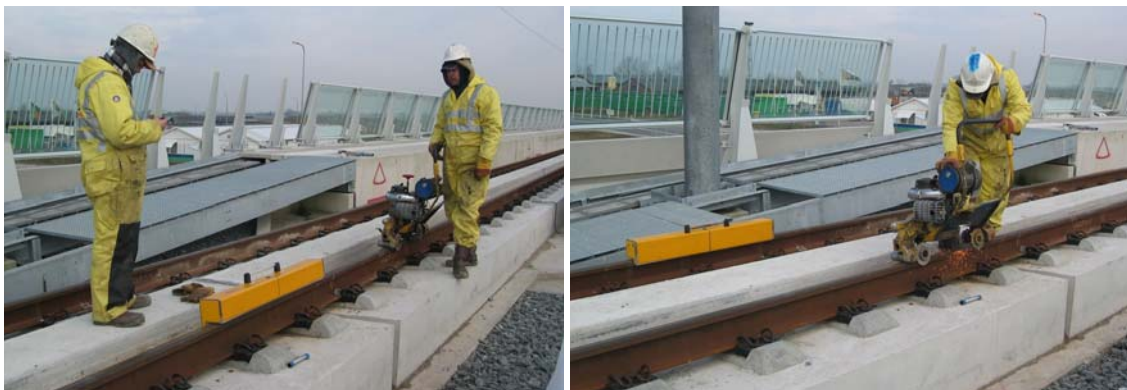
Geometrical weld quality control (with RAILPROF device) and fine manual grinding on the HSL-South
